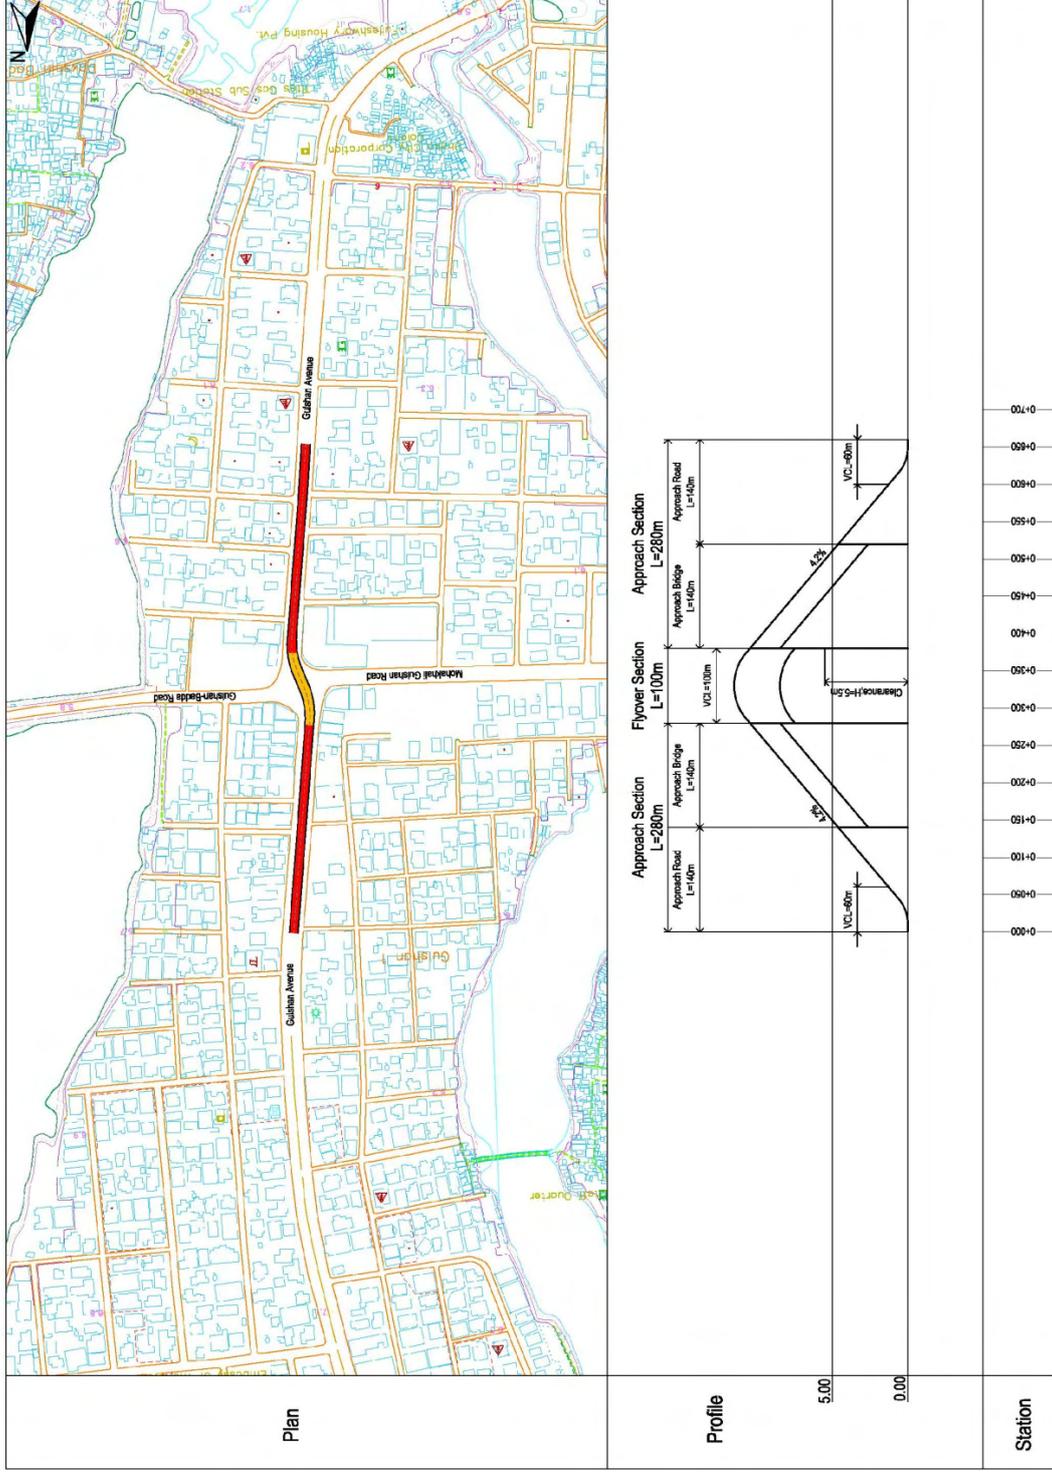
Layout Plan and Profile of Gulshan-1 Flyover Plan
